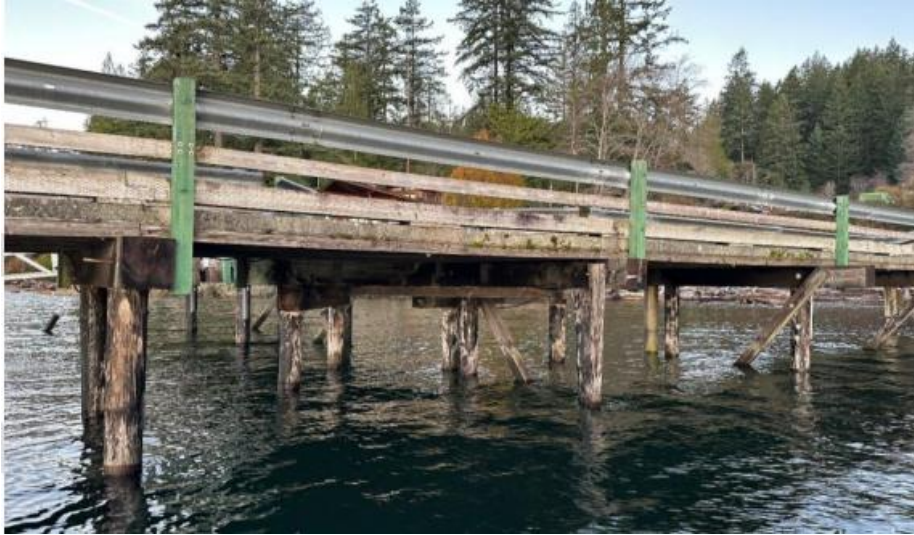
Gambier Harbour – Typical arrangement of timber piles
